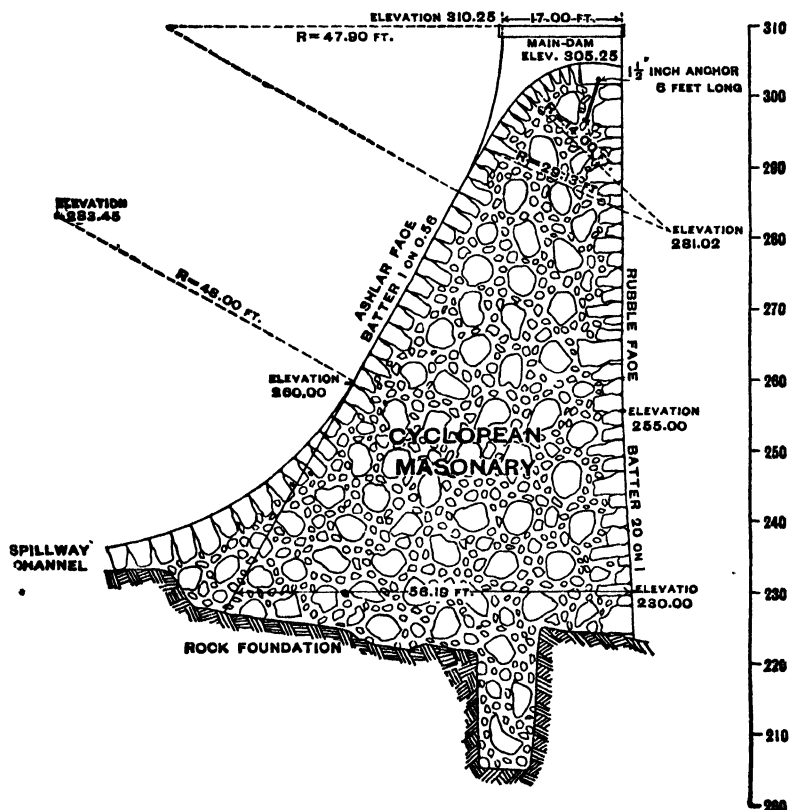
Section through Overflow of Boonton, N. J., Dam. (See p. 772.)
